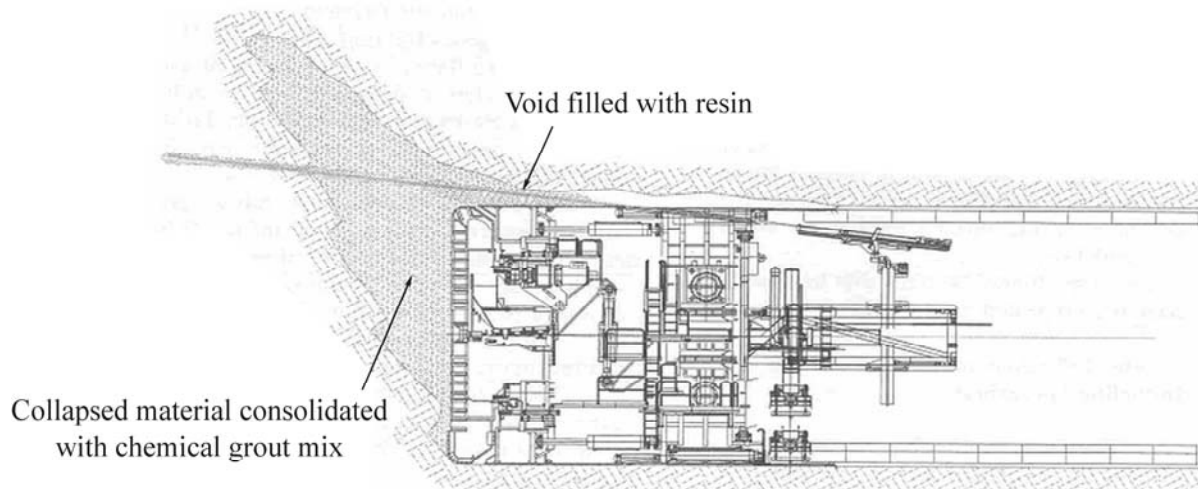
Face stabilization treatment used in the Abdalajis tunnel (Courtesy SELI S.p.A.)
